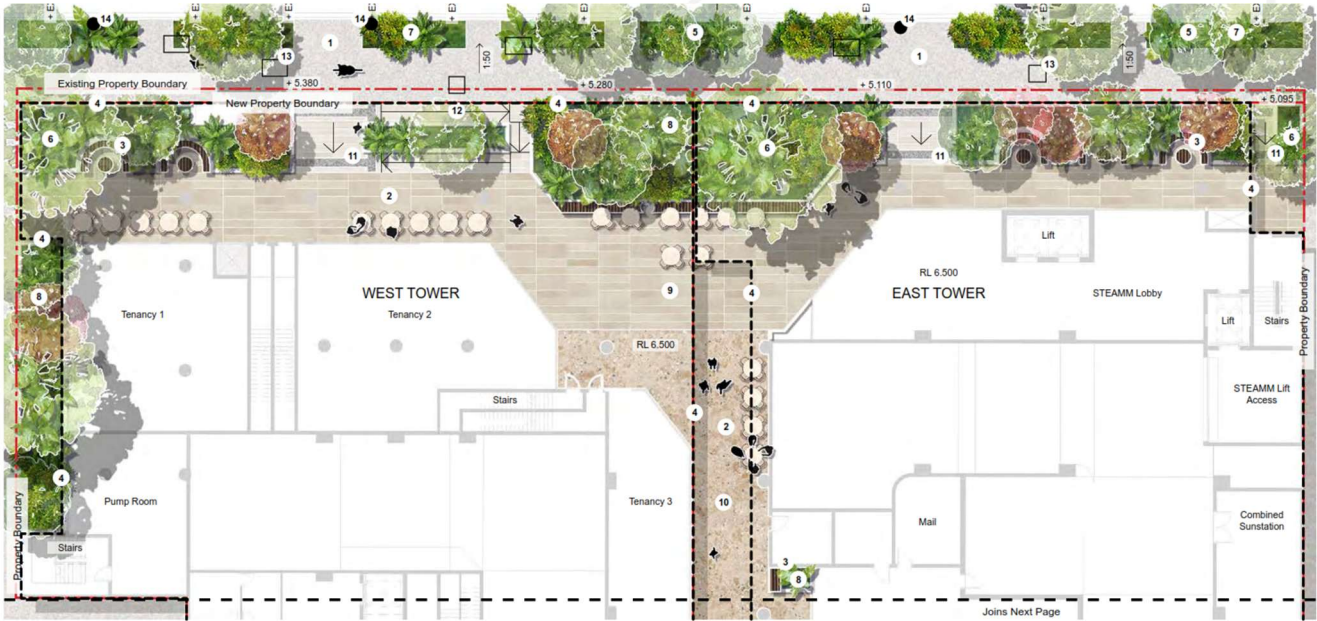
Extract from Landscape Concept Plan showing pedestrian plaza area along the Stanley Street frontage (Wild Studio)
